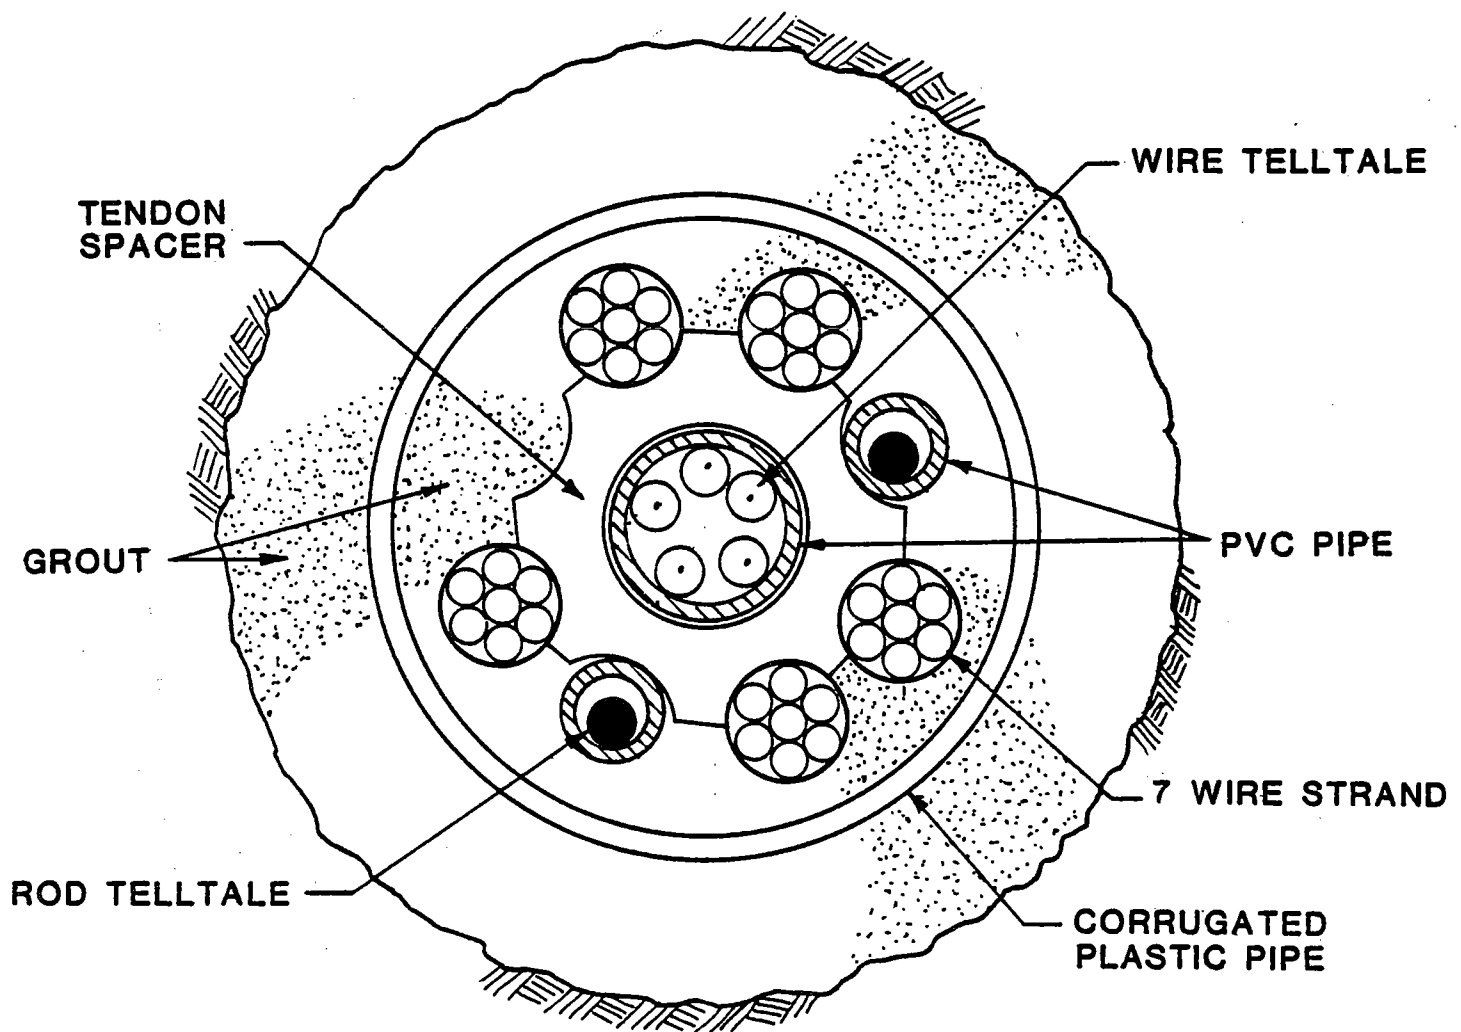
SCHEMATIC OF TYPICAL INSTRUMENTED TIEBACK ANCHOR
